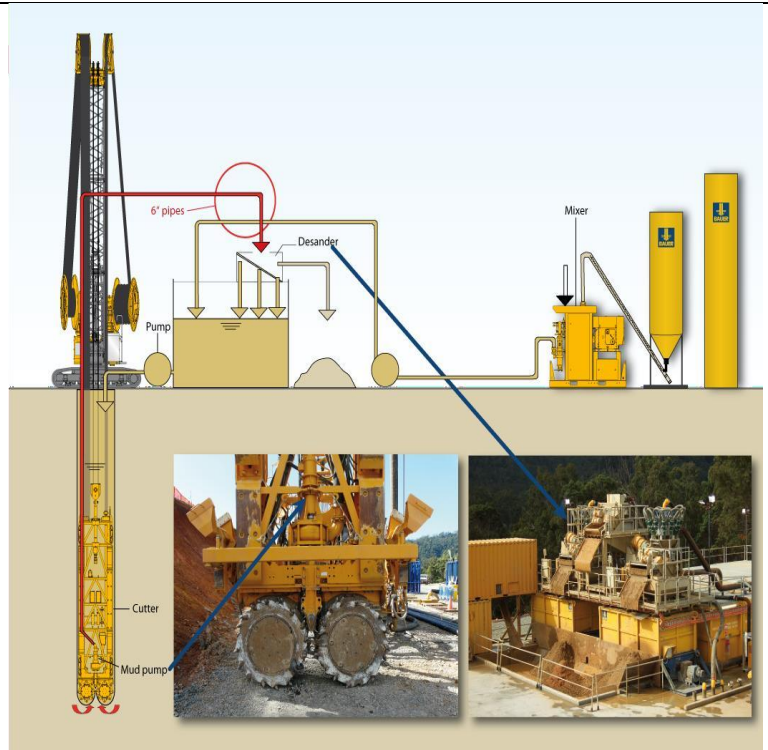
Cut Off Wall Construction Set Up for ECRF Dam
